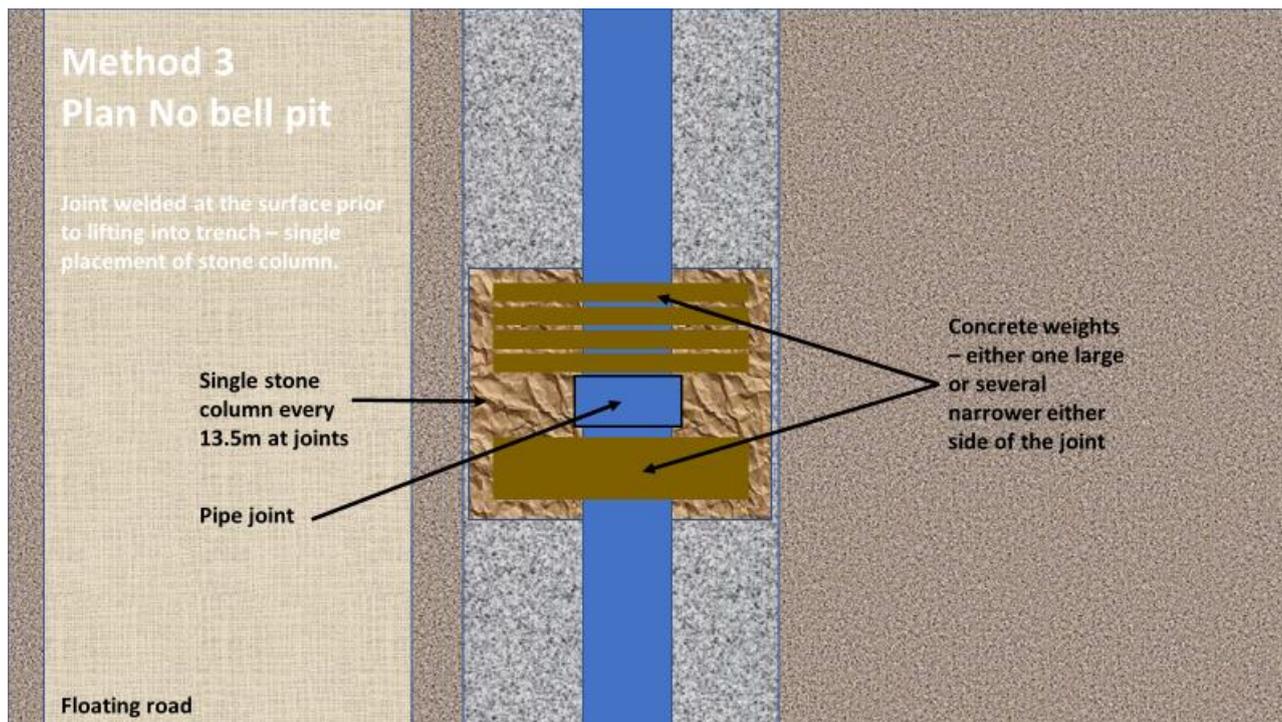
Method 3 Plan View of Joint without Bell Pit
